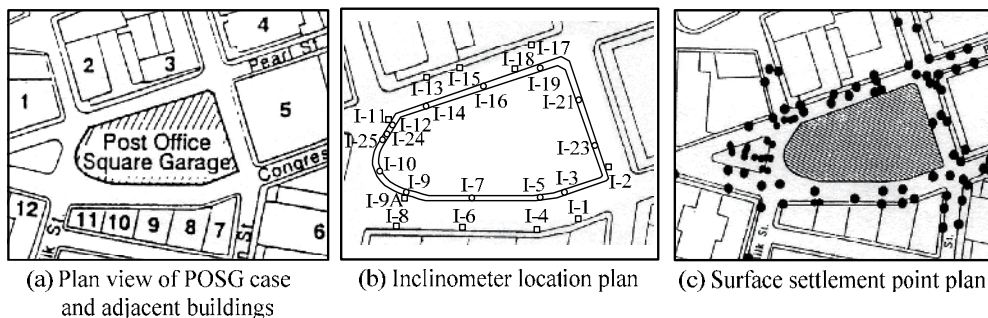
Plan view of the POSG case and the instrumentation plan (after Whittle et al., 1993)
